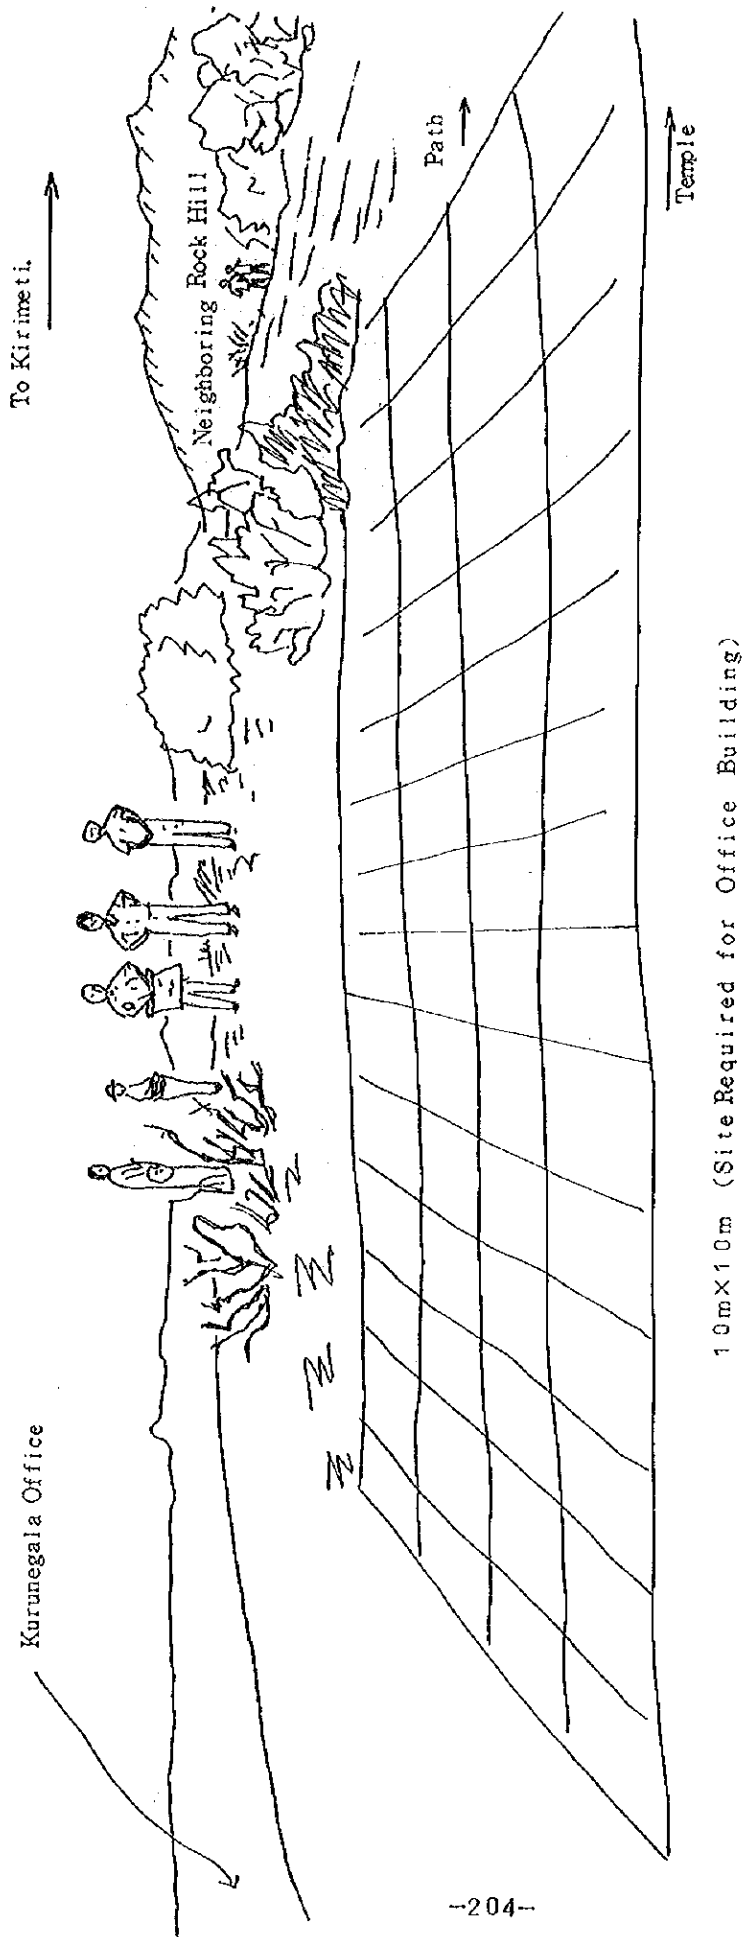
Sketch of Site Required for Office Building on Kurunegala Rock
